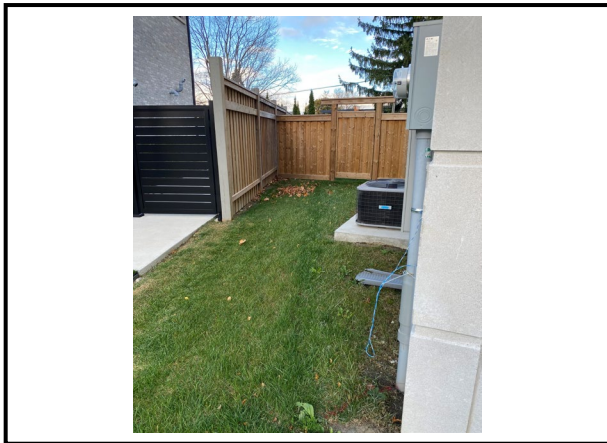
Photo shows the entrance to the rear yard/backyard where a proposed cabana (accessory structure) is to be facilitated.
